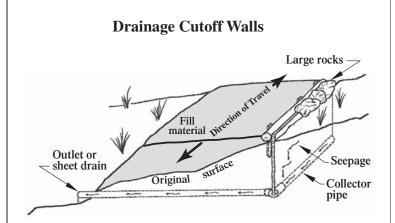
A sheet drain or geonet can be used to intercept seepage.
